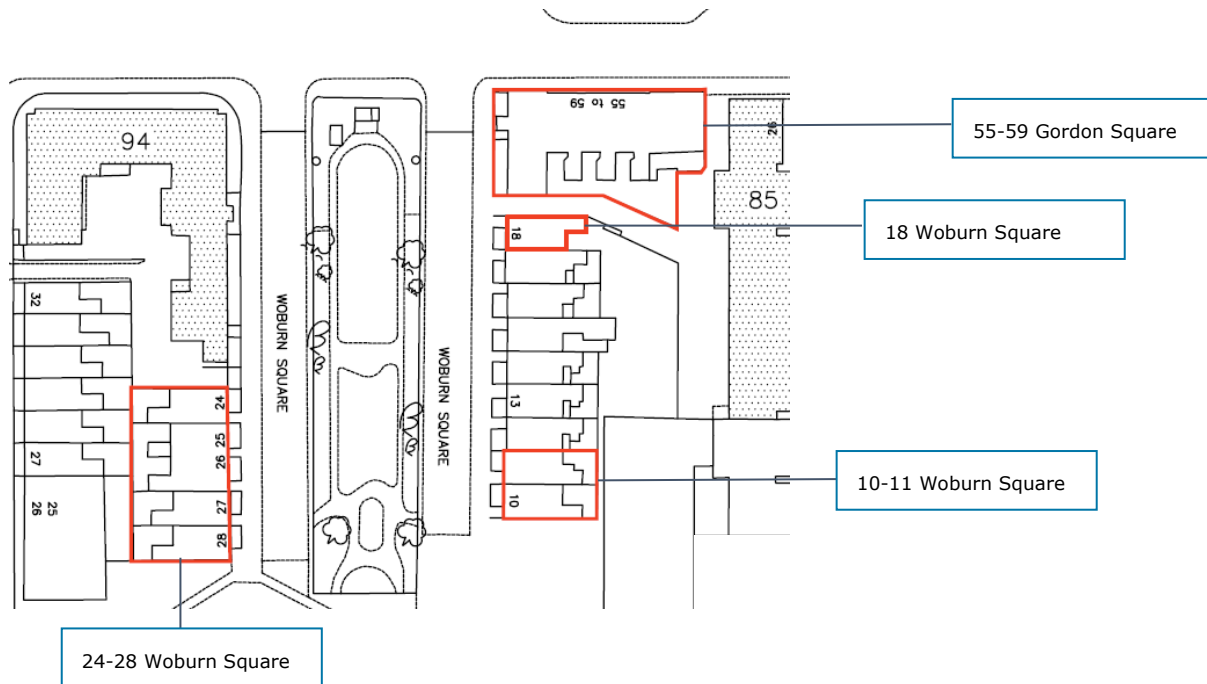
Site Location Plan (Source: Design Document prepared by Place Marque)
